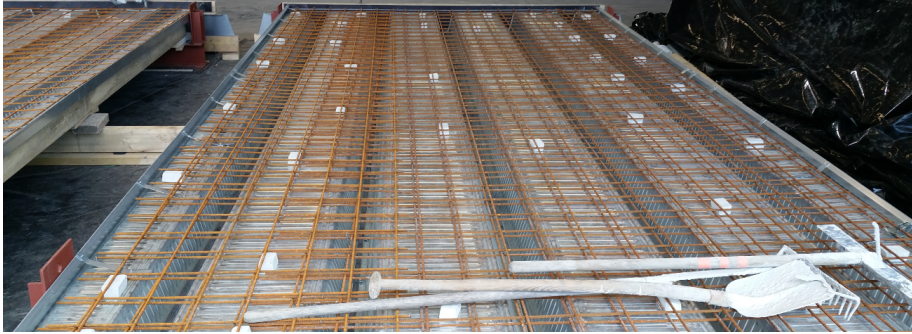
The test piece with connected steel decks and installed reinforcement bars and top and bottom meshes.
